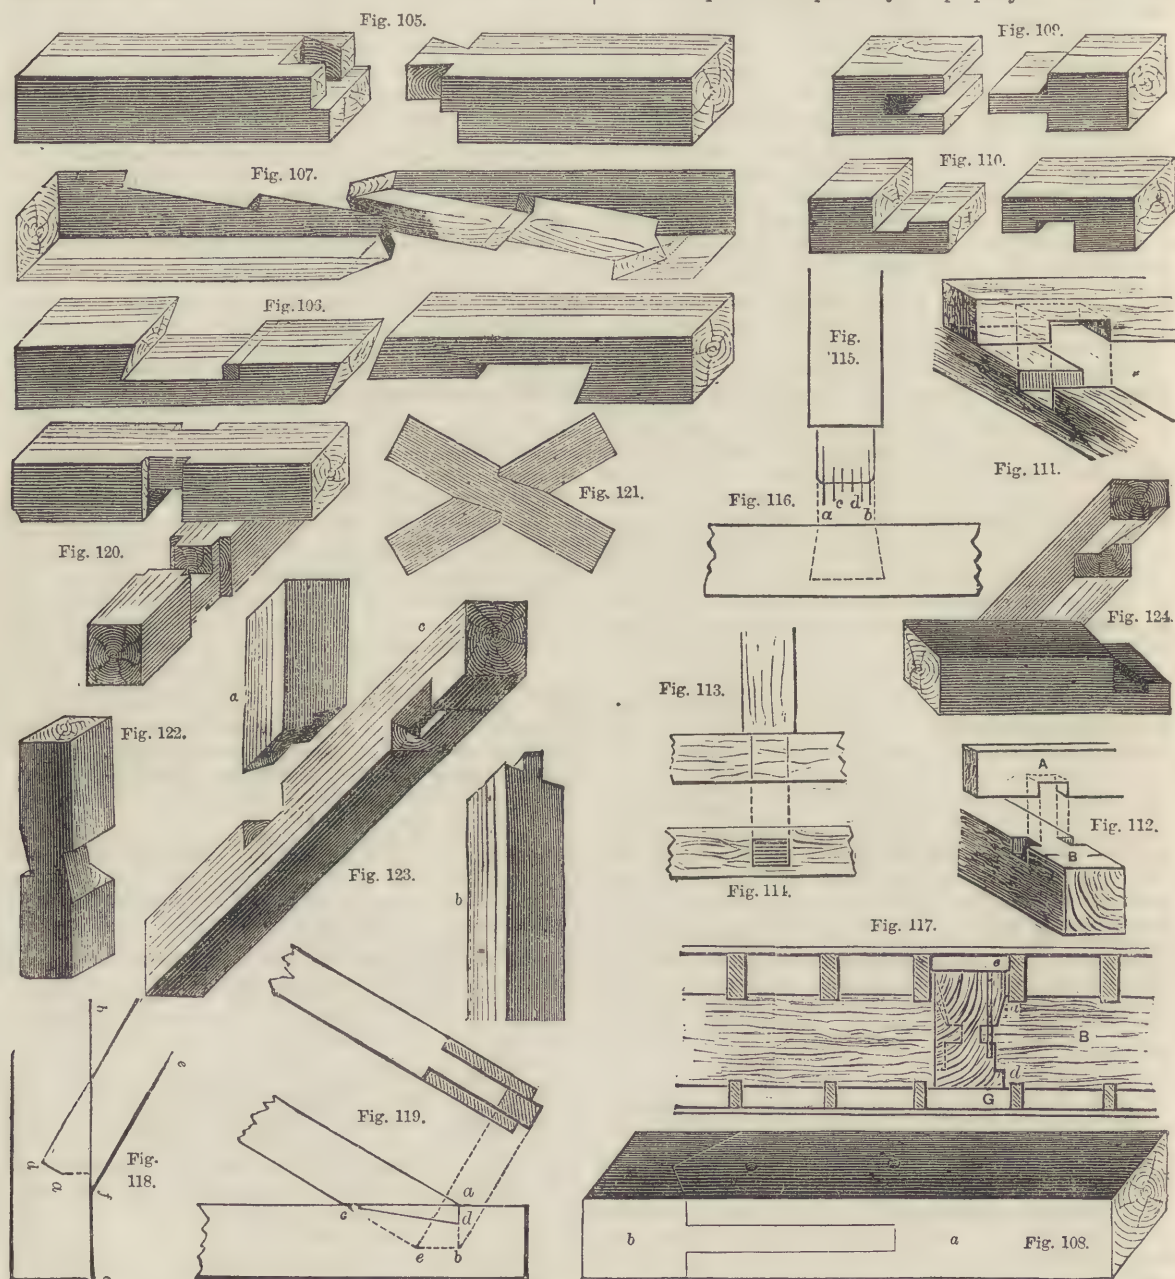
is a joint effected by a tongue or tenon in the one part (b) fitting into a mortise or slit of similar width in the other (a). This is considered a very good joint when the beam so joined is supported by a column underneath the joint. In such cases it may be placed on its narrow side, so that the width of the tongue may be vertical. The sides of the part a then strengthen the beam against lateral strain. This method, too, is found very effective when used vertically, there being no possibility of the parts slipping over each other. In this case
